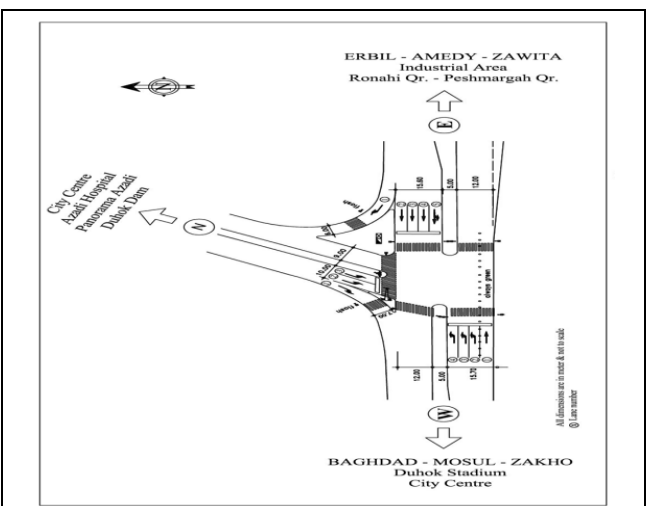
Silav Intersection (SIL) Plan (Directorate of Traffic, Duhok City, 2009)
